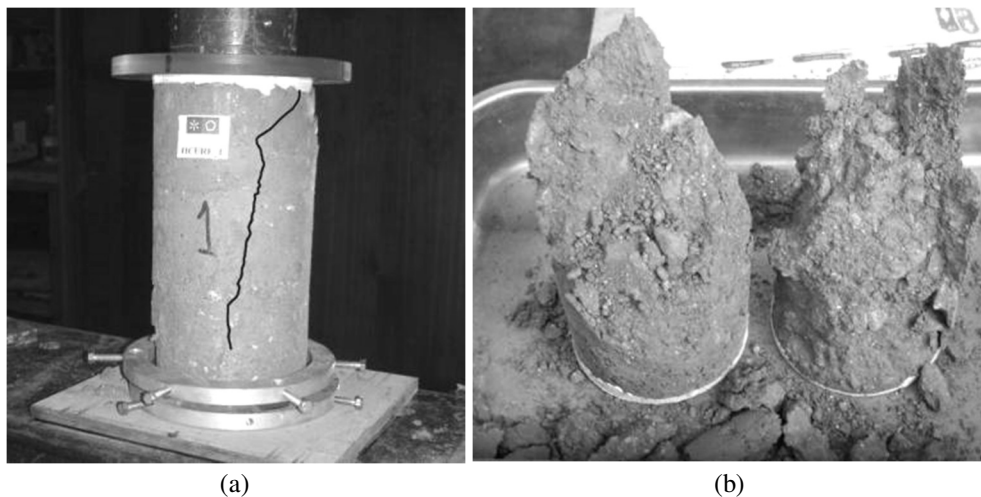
Failure mode of the rammed earth cylindrical specimens: (a) formation of a diagonal crack; (b) main vertical/diagonal crack formation with spalling of the specimen surface.
